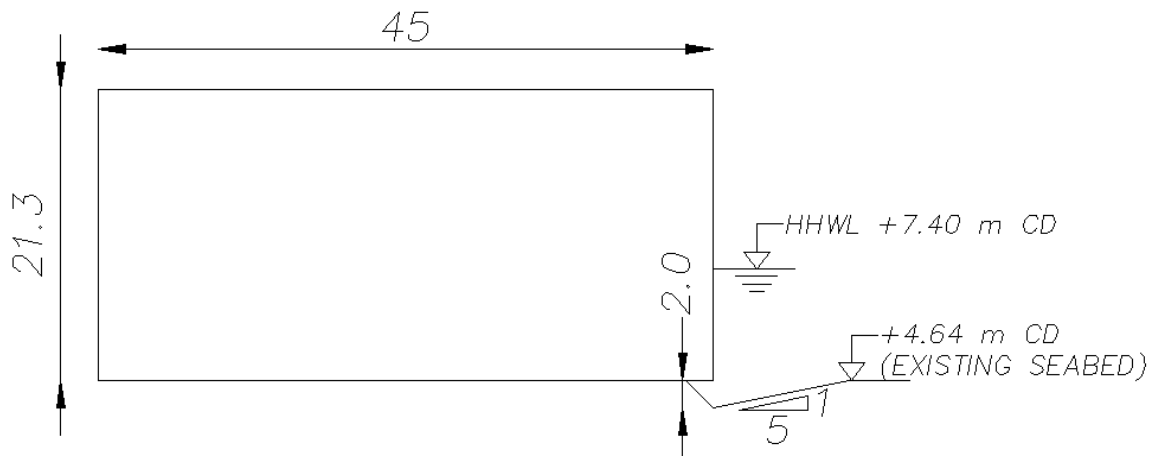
Expected Scour at Toe of SW Anchor Block, Section
